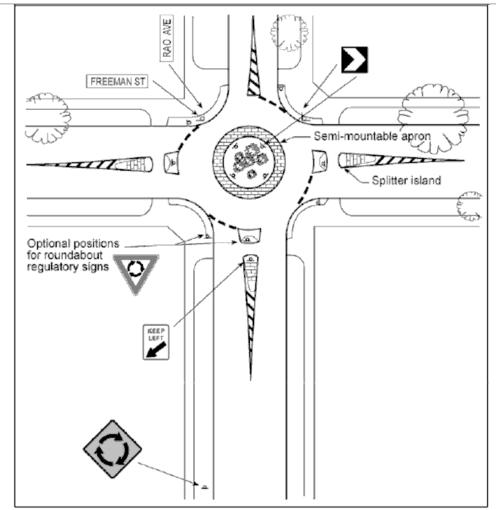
Typical Delineation & Signage Layout of Roundabout
